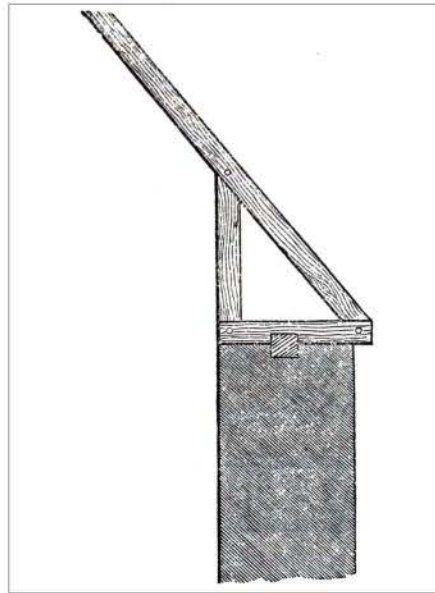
DIAGRAM OF WALL AND ROOF JOINT. *OPEN TIMBER ROOFS* (1847). | SPECIAL THANKS TO MALCOLM THURLBY.
